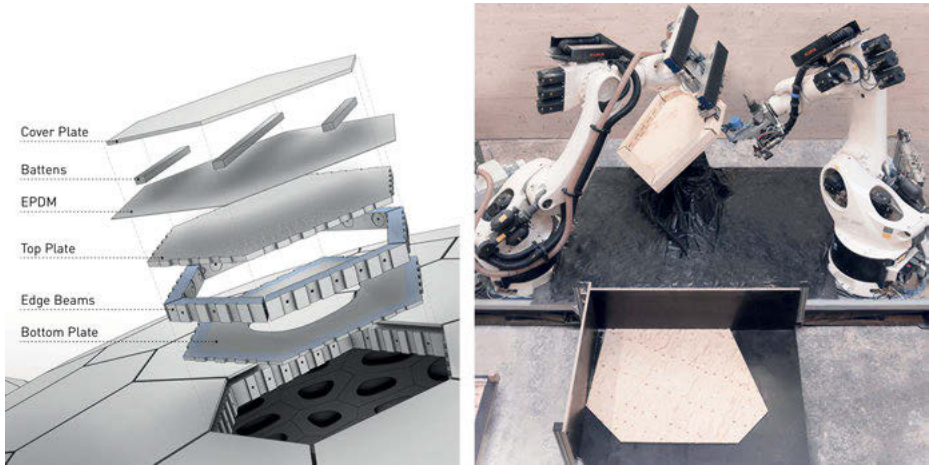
Segmented timber shell building system of BUGA Wood Pavilion. Left: Exploded view of hollow cassette building system. Right: Robotic prefabrication of building system. Images: ©2019 University of Stuttgart.
